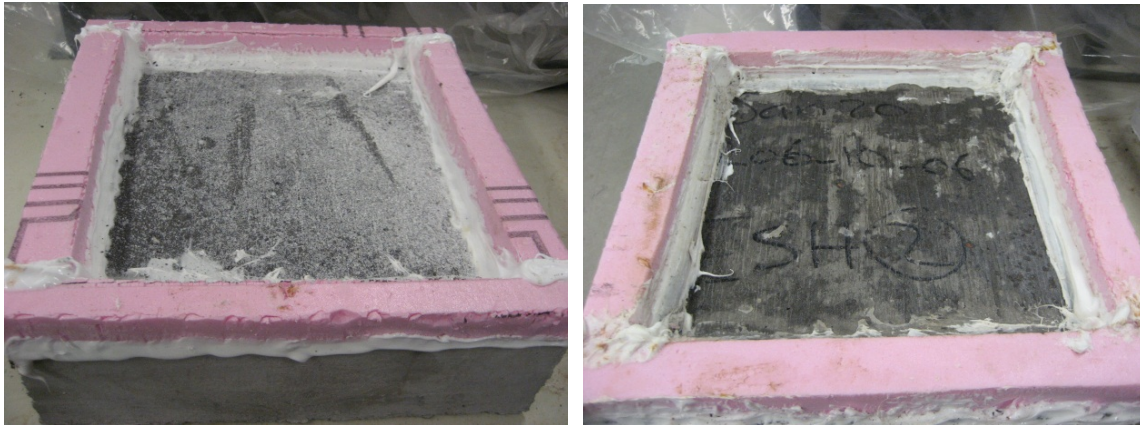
ESH-LWSCC specimens undergoing salt scaling test
